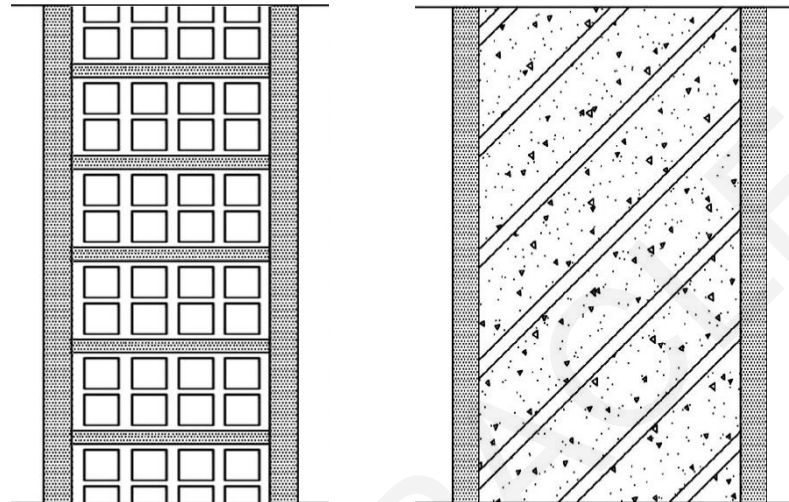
Masonry construction detail. Materials from outside to inside: 25 mm cement mortar, 200 mm perforated ceramic brick, 25 mm cement mortar and Reinforced concrete column construction detail. Materials from outside to inside: 25 mm cement mortar, 250 mm reinforced concrete, 25 mm cement mortar [38].
